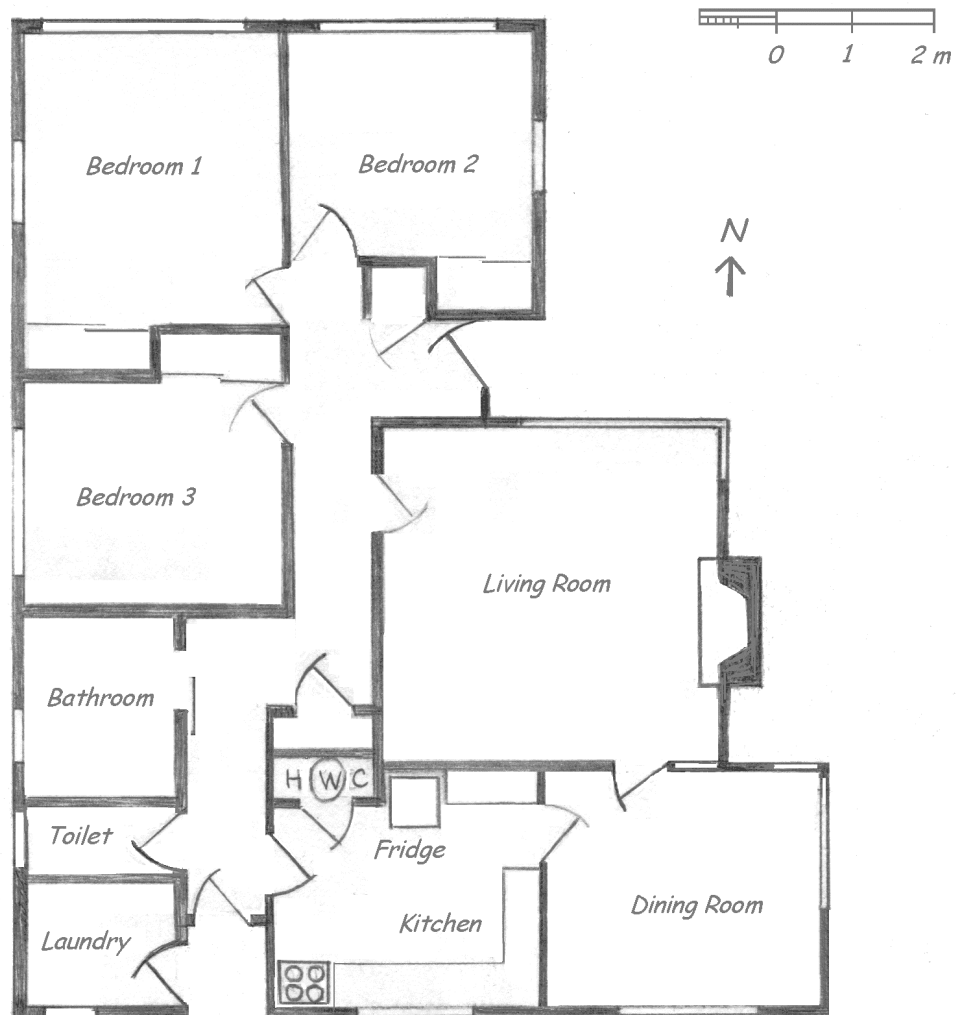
Floor plan of the Palmerston North house (scale 1:100)
